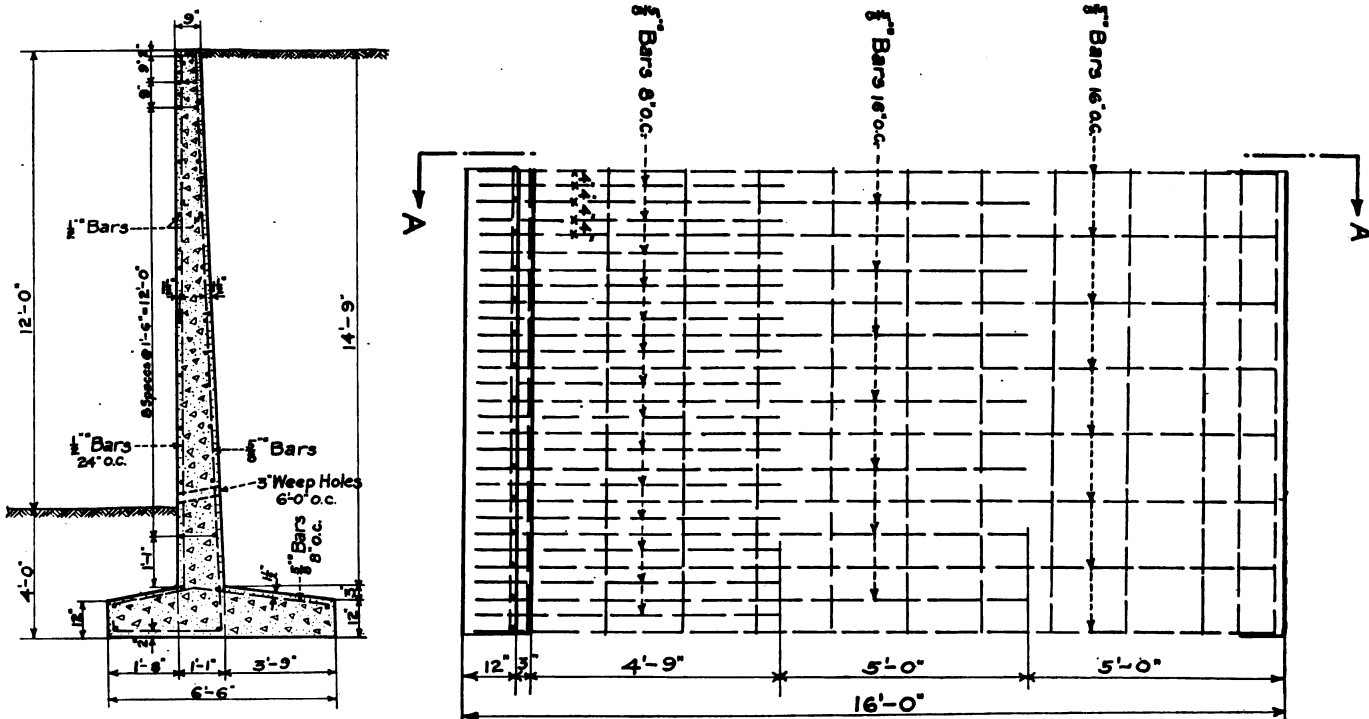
Section on AA and Elevation of Retaining Wall, Illustrating Size and Placing of Reinforcing Bars
